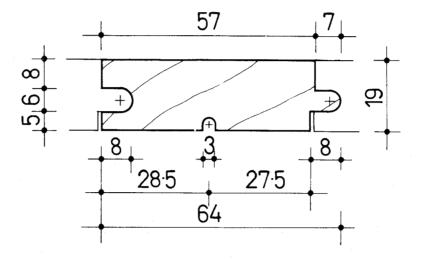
75 mm x 25 mm TONGUE AND GROOVE FLOORING (full size)
